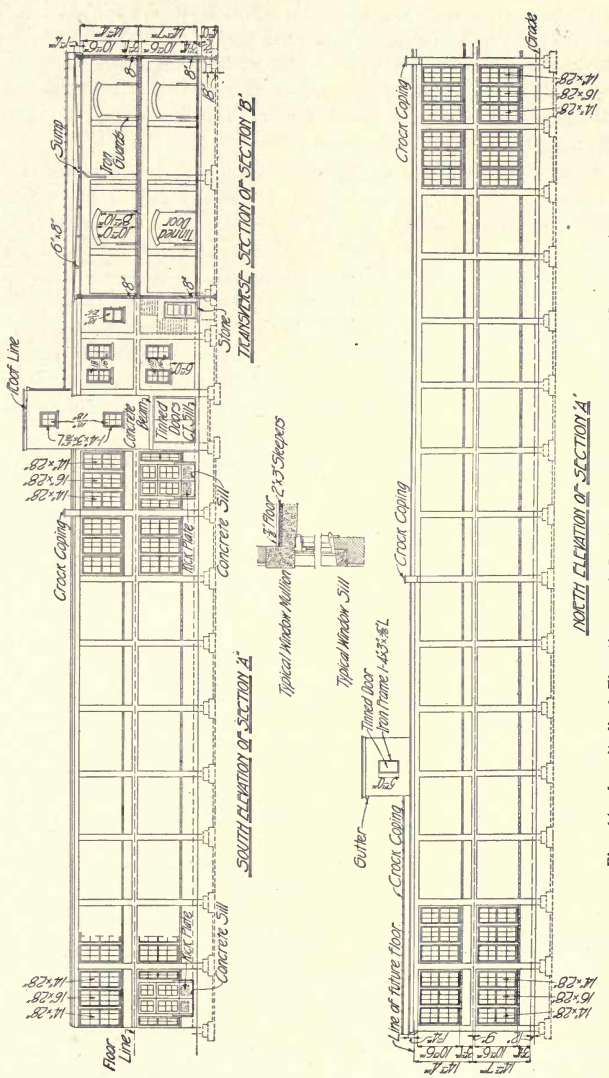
Longitudinal Elevations and Sections of Packard Factory. (See p. 131.)
